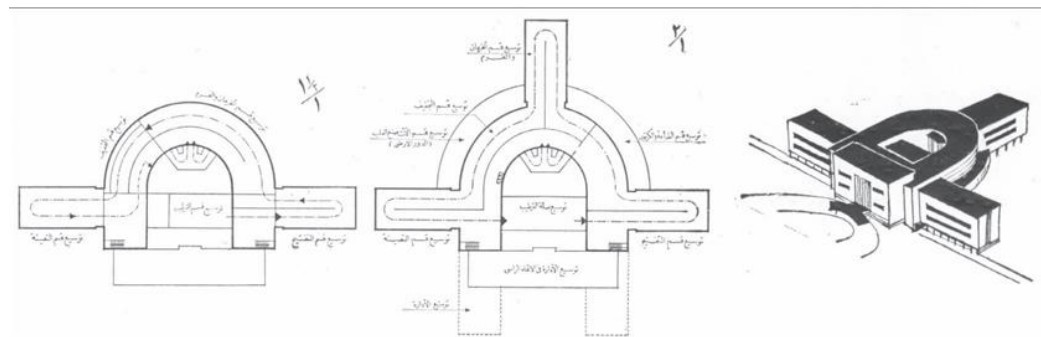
Egypt manufacturing facility for Tobacco and Cigarettes' Conceptual layout, with sketches of prospective expansions.
